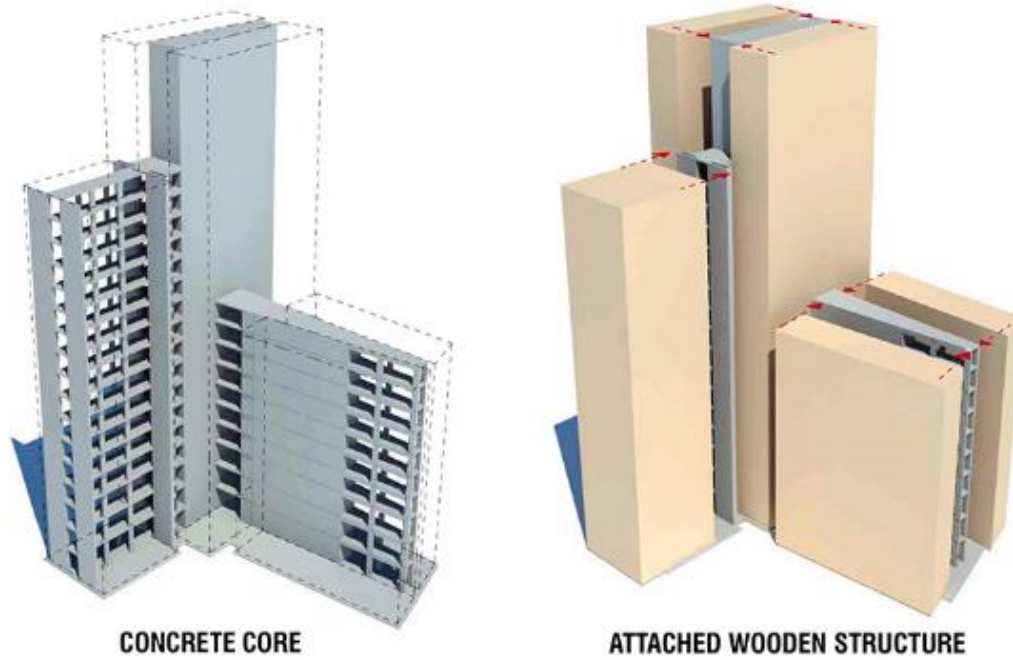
3 The structural system of the HoHo building, showcasing the concrete core and the wooden structure (Big See, 2022)
